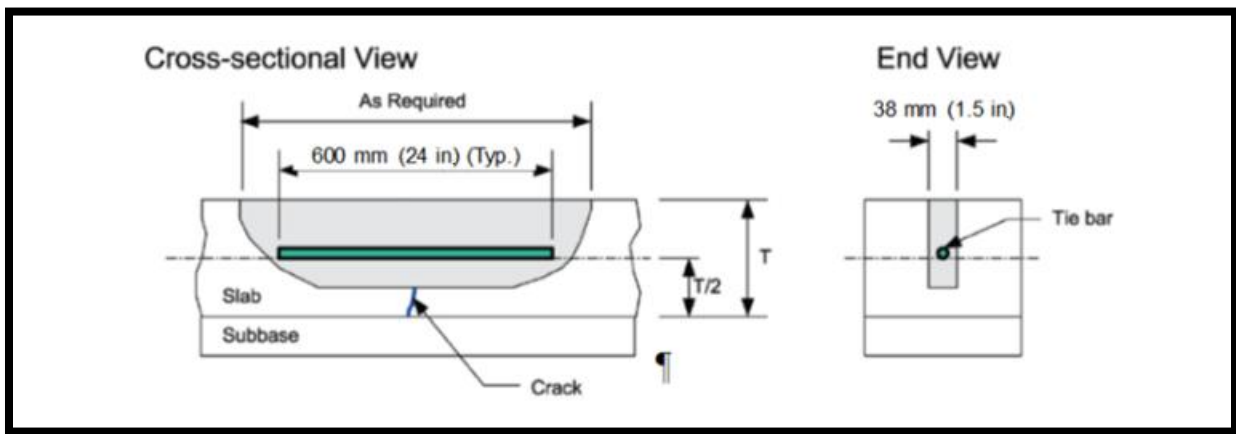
Placement of Dowel Bars (AASHTO T3: Pavement Preservation: Dowel Bar Retrofit, Cross Stitching, and Slot Stitching)
